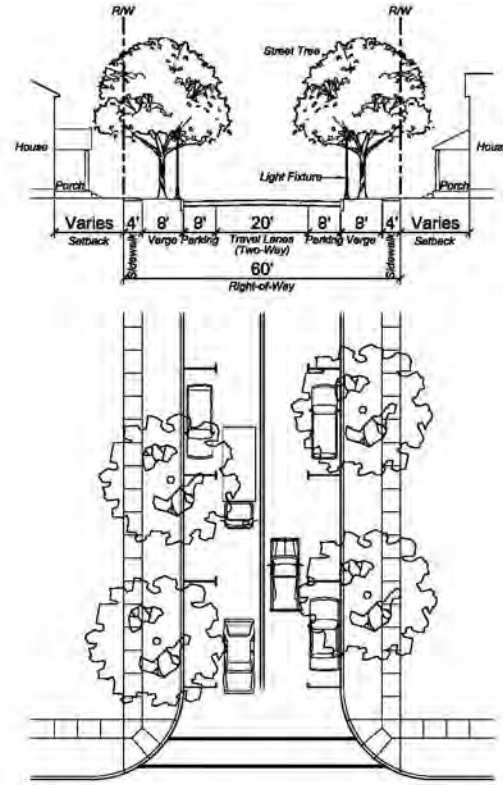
Section and Plan: Neighborhood Street B1
